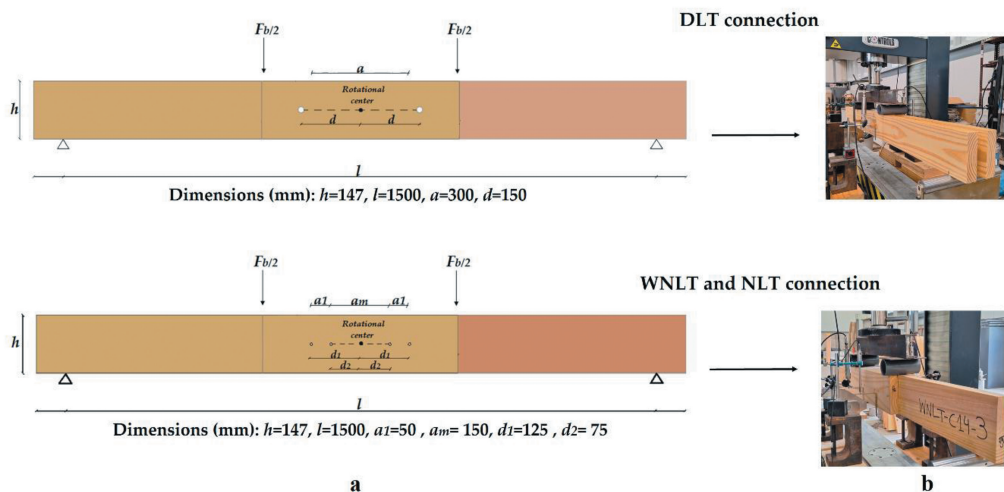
Bending tests on timber connections. a. Geometric configuration (adapted from Ruan et al. 2022). b. Test setup.
